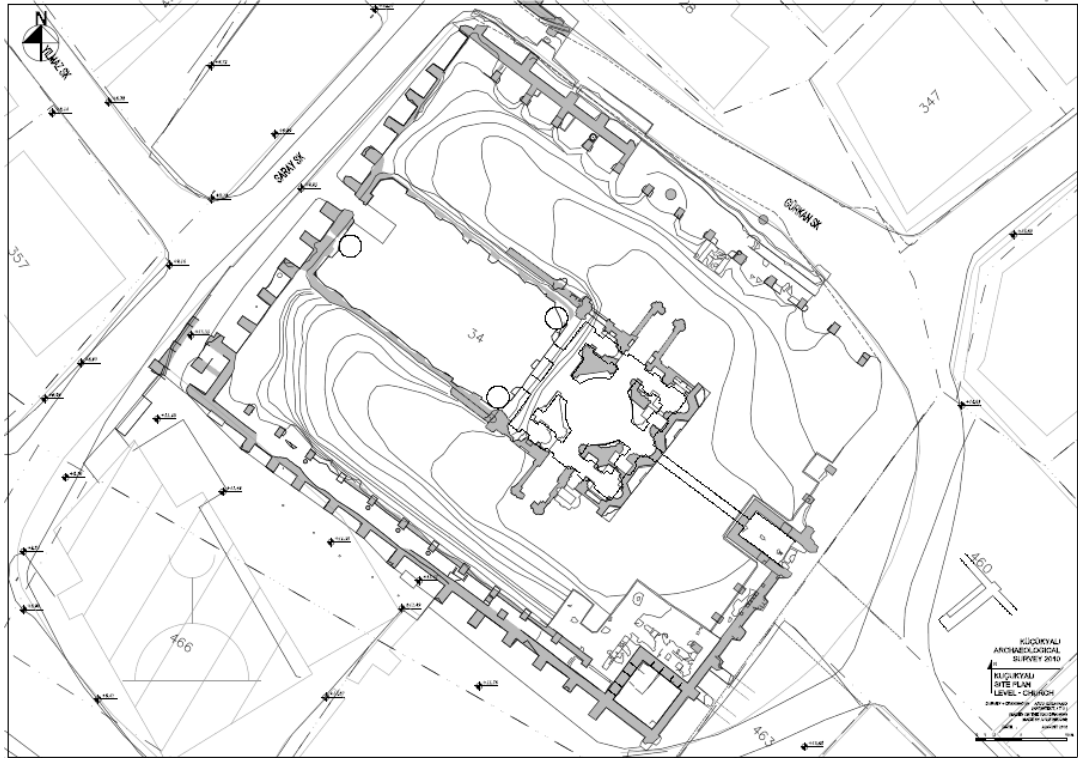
Küçükyalı site plan from the KAP archives (2010).
